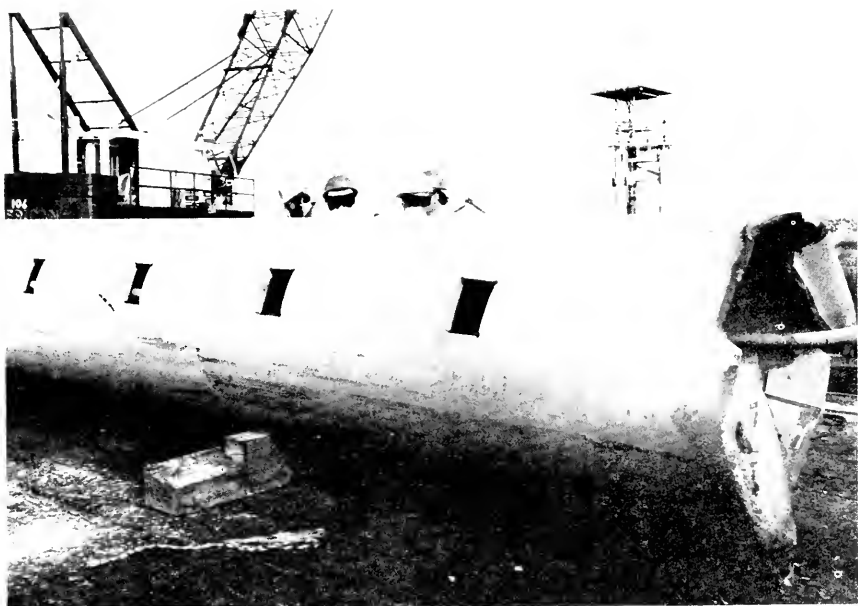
Bow leg after salvage. View illustrative of size. Rectangular openings are jacking pin holes.
